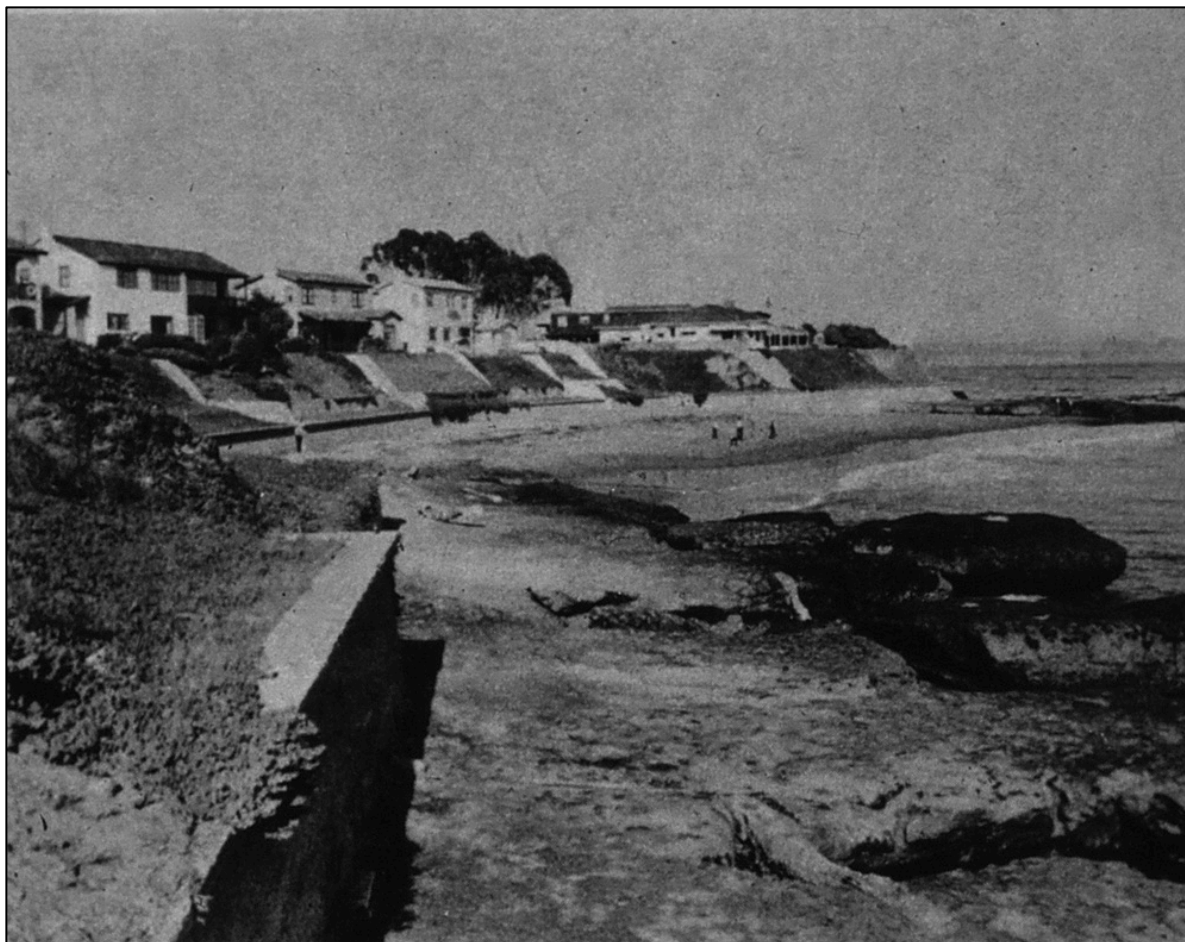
Continuous concrete seawall constructed in 1934 extends from Soquel Point to Pleasure Point (1954 photo by US Army Corps of Engineers).
